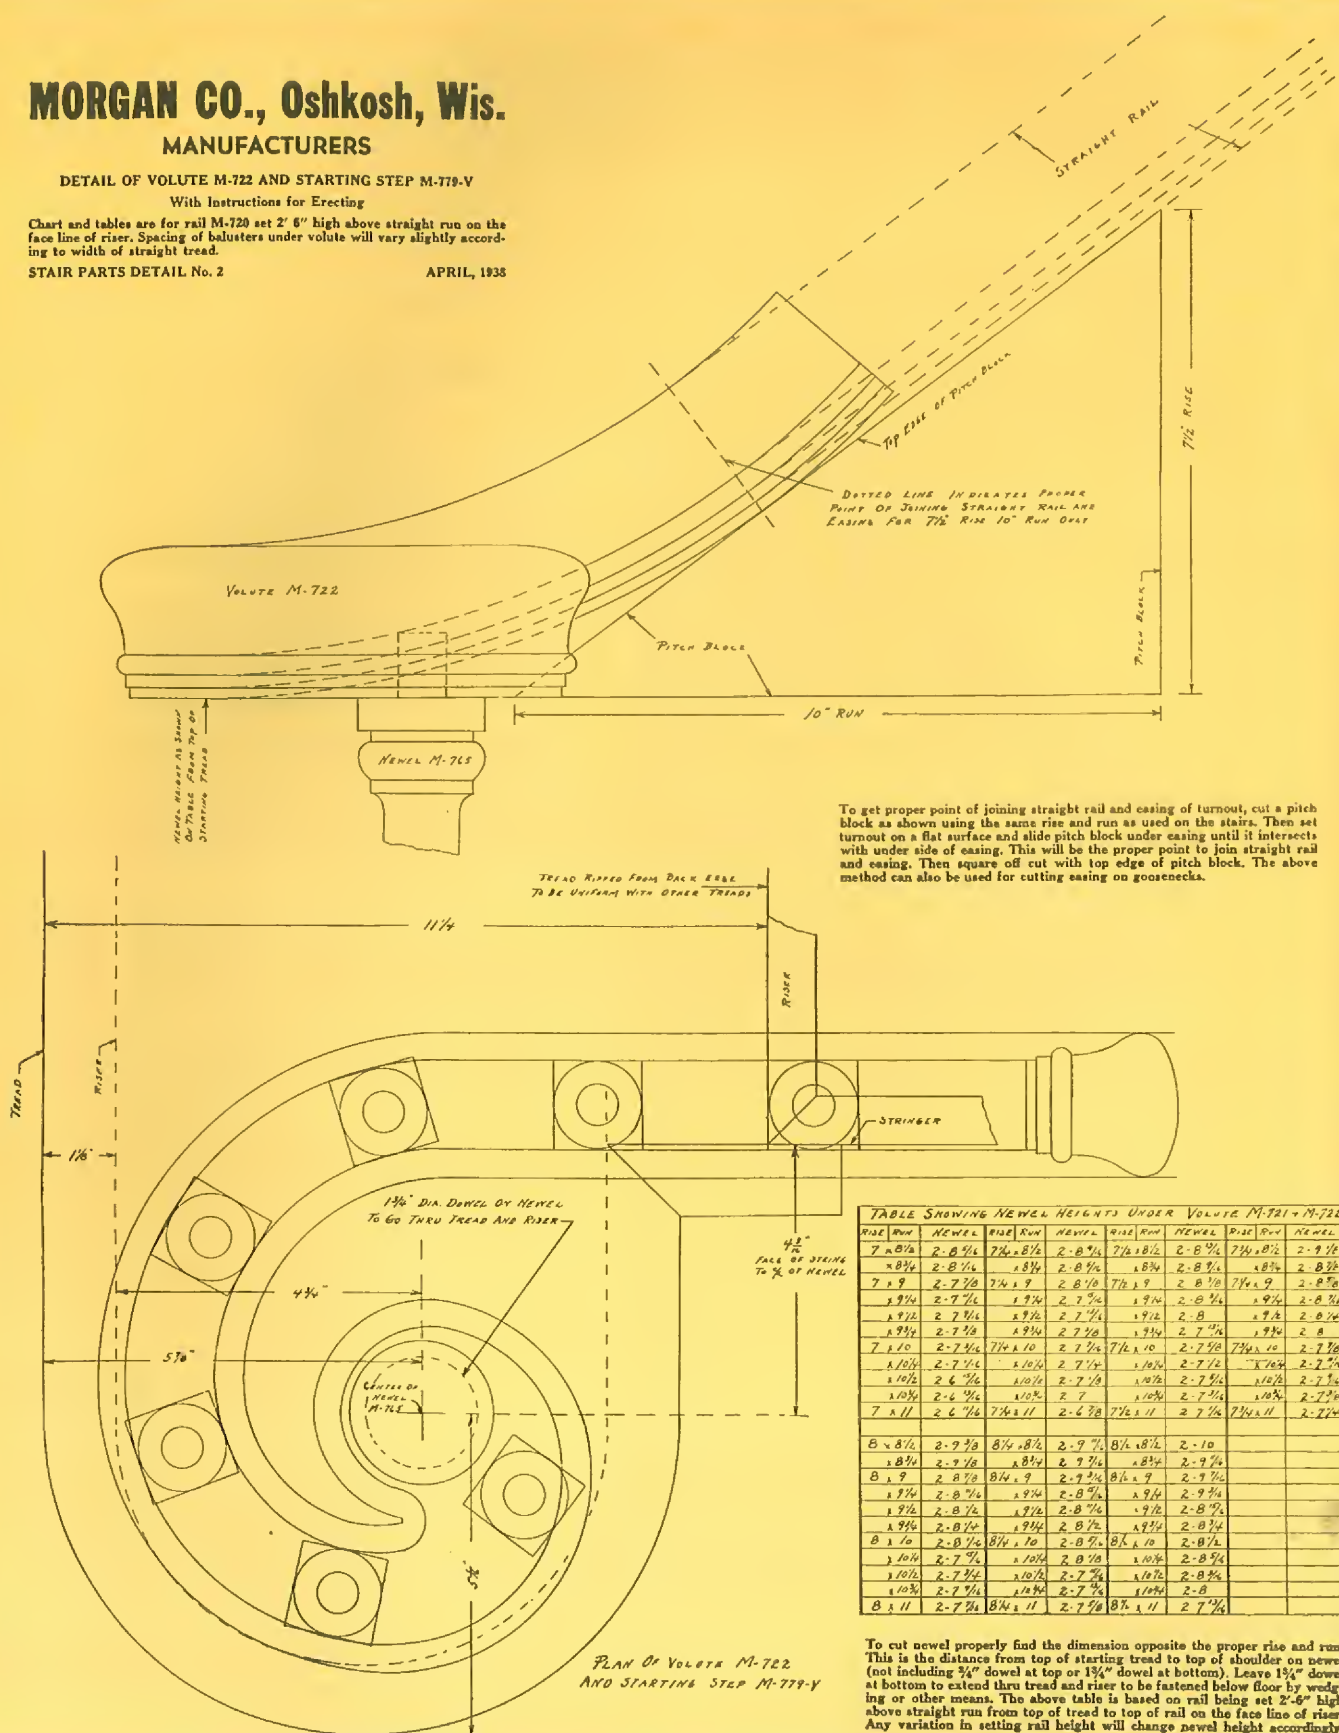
DETAIL OF VOLUTE M-722 AND STARTING STEP M-779-V
